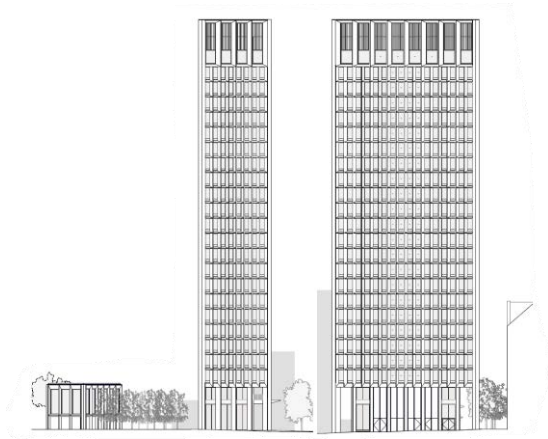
Elevations of the proposed student buildings (Northwest and Northeast)
